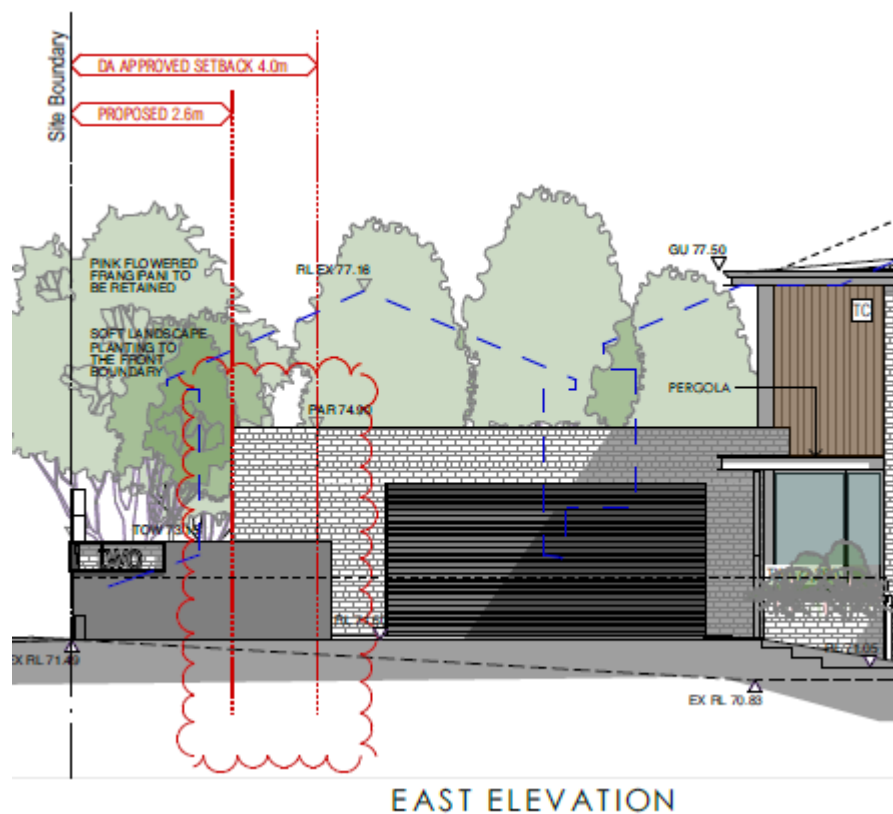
Plan extract of eastern elevation showing proposed single storey carparking structure located some 2.26 metre lower, and 500mm setback further into the site, than the existing carparking structure at the front of the subject property as outlined in blue.
